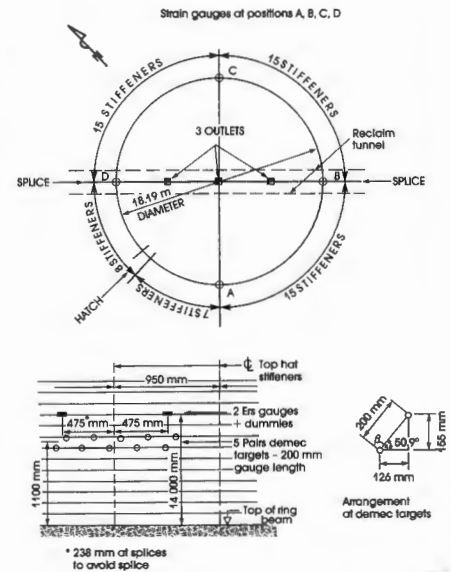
Silo layout in plan and layout of instrumentation on wall
